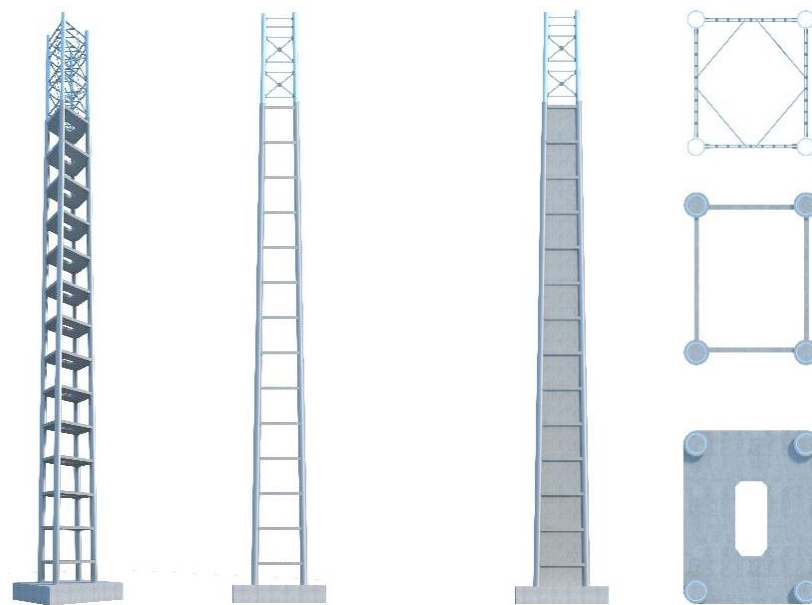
Principle of robust frame reinforced concrete bridge pier construction
